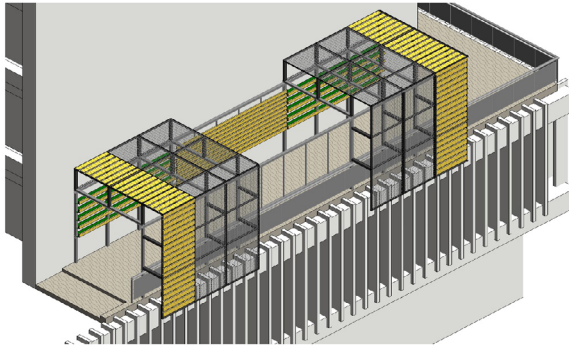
Isometric drawing of Neighbourgoods Market deck area, indicating two steel boxes with timber cladding, and timber-cladded galvanised steel gutters between the two frames
